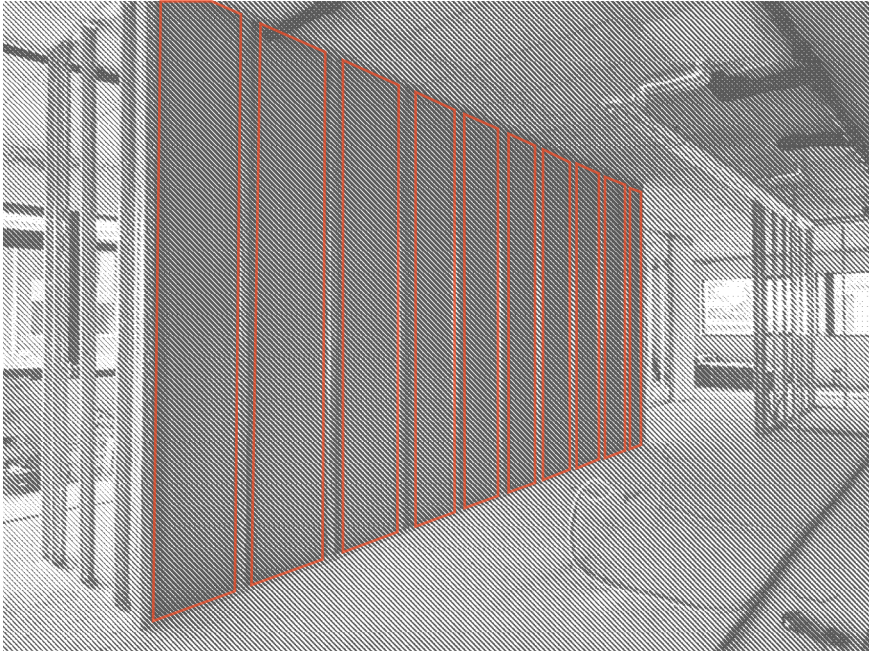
Over a tonne of waste was saved in the drywall construction trade.
